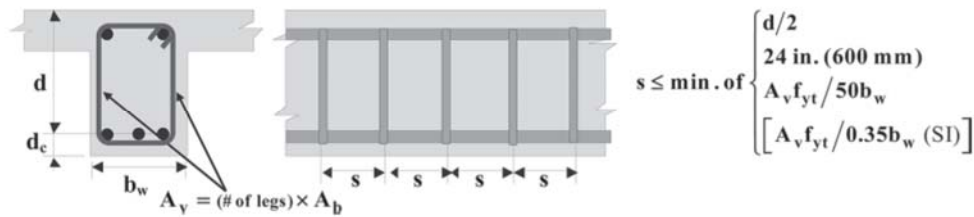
Minimum shear reinforcement in girders, beams, and joists when $(\phi V_c/2 \leq V_u < \phi V_c)$.
